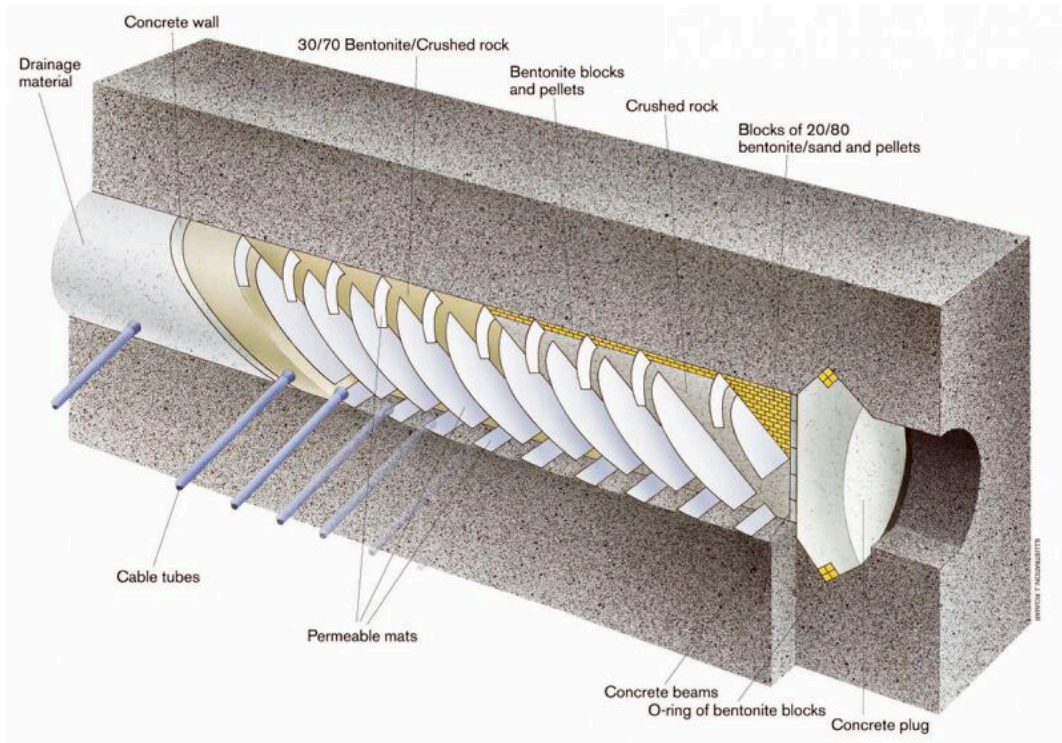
Prefabricated wall at the tunnel end of Section II of the Prototype Repository.
